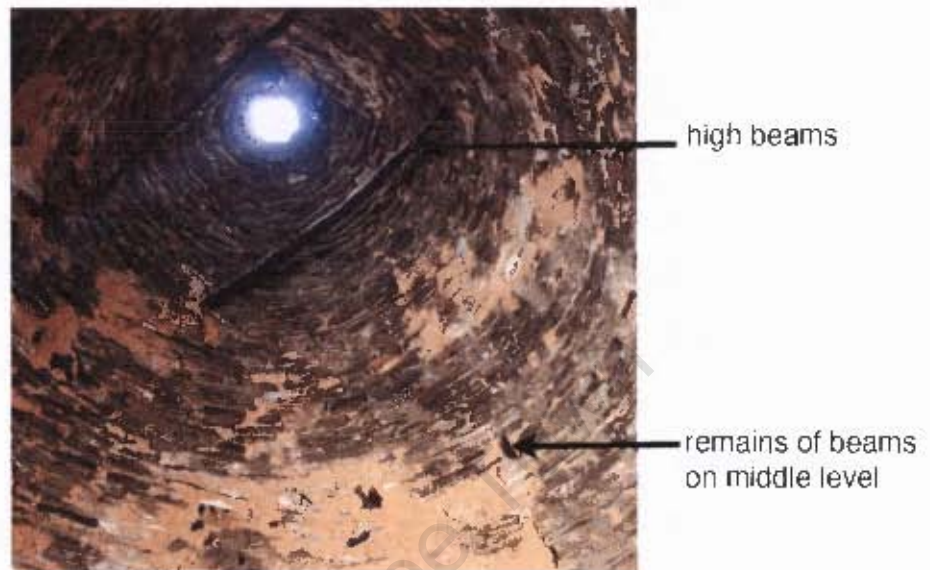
Grootfontein. Rough karee cross beams in a late 19th century building.
